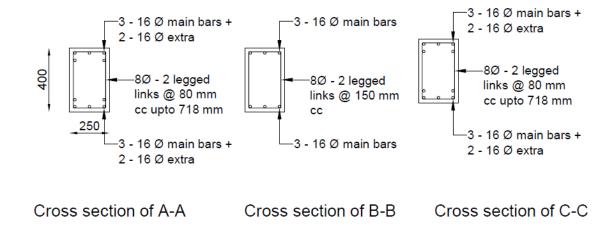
Cross sections of beams at different locations for all the basement floors
